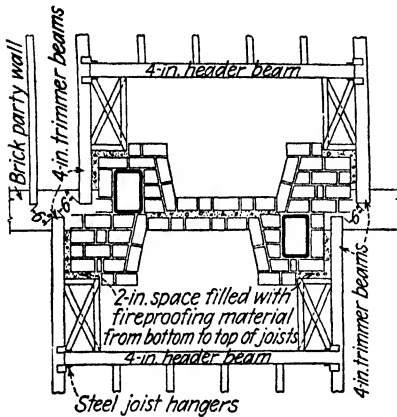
Method of building two fireplaces back to back in a brick party wall to secure proper spacing between ends of floor joists.
